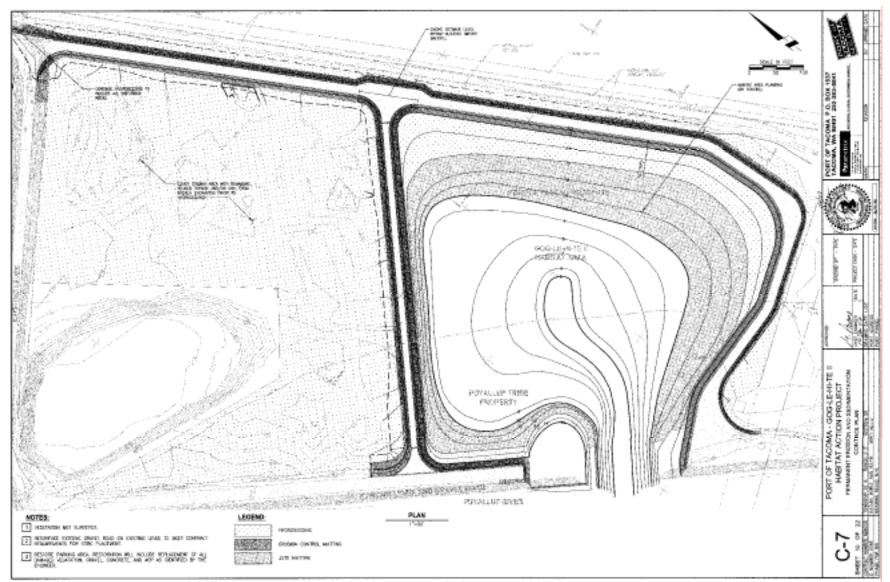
Proposed Gog-le-hi-te II Mitigation Site Levee Alignment, Excavation, and Erosion Control Plan
